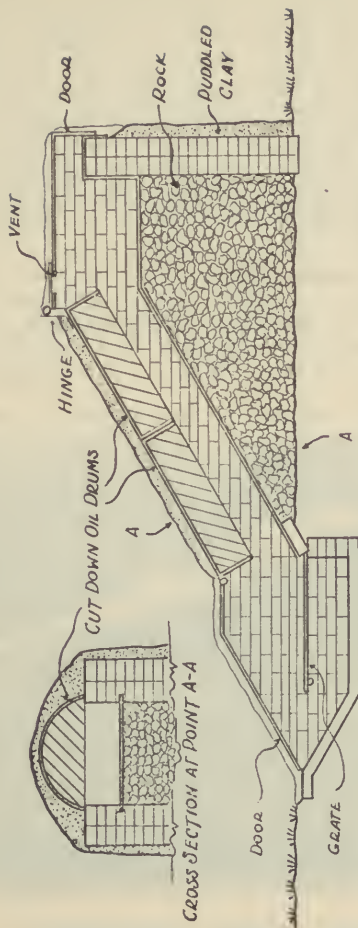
Inclined plane Incinerator, in longitudinal and cross sections, to indicate plan of construction.
